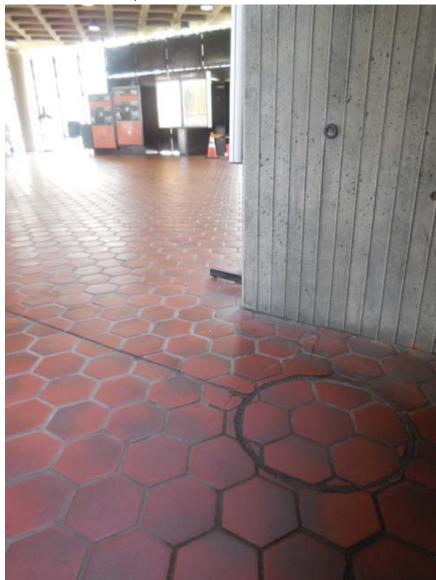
E07 West Hyattsville – Handhole in mezzanine floor
